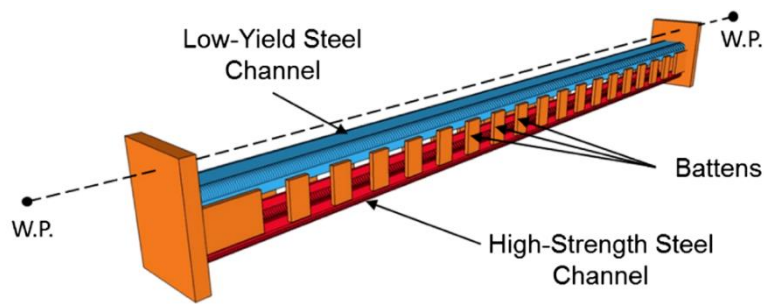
Eccentric brace fabricated by welding different steel materials ^{1.12)}
